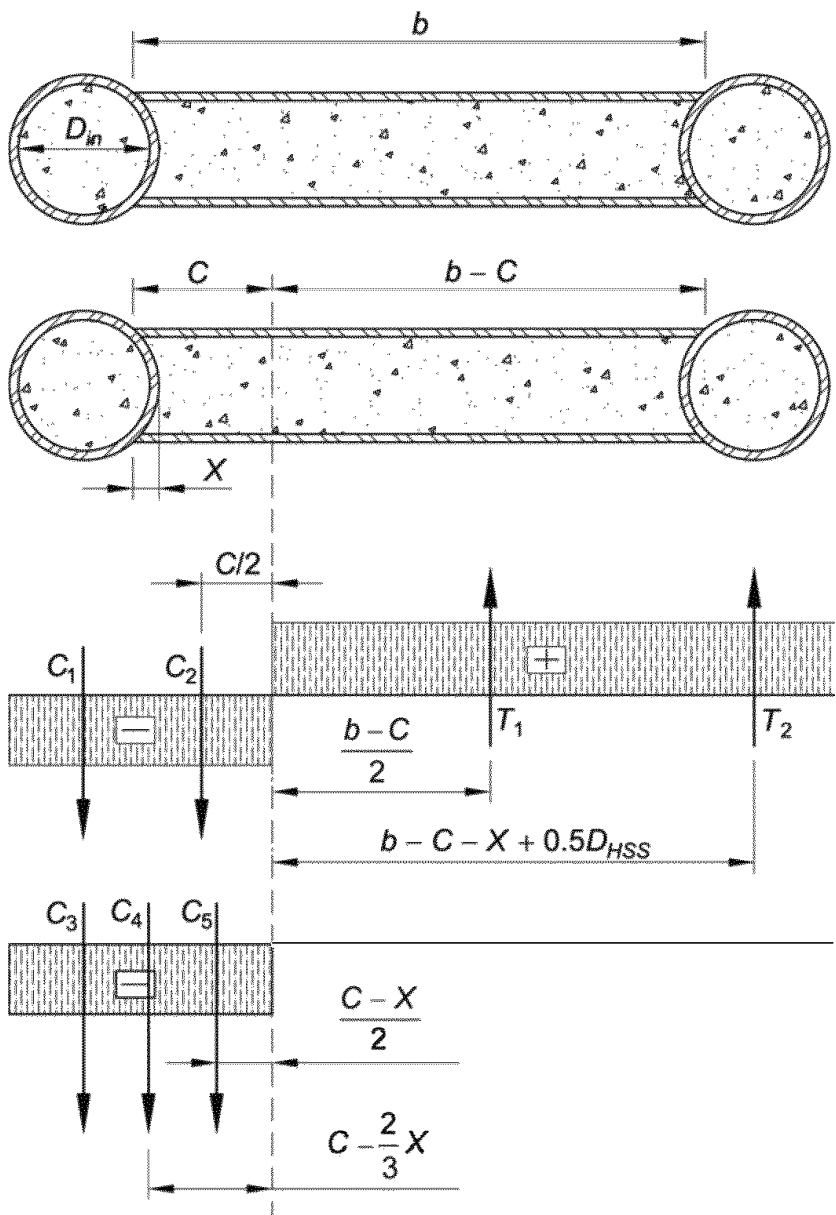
Schematic diagram for stress distribution on C-PSW/CF cross section.
